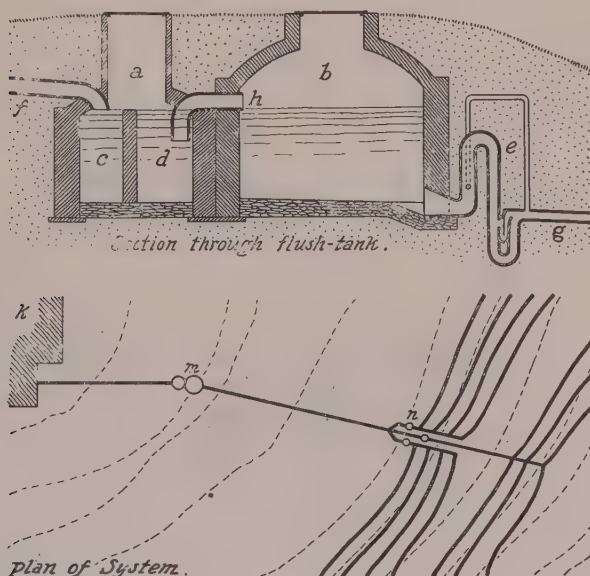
Showing the flush tank for the sub-soil system, with plan of pipe outlay
